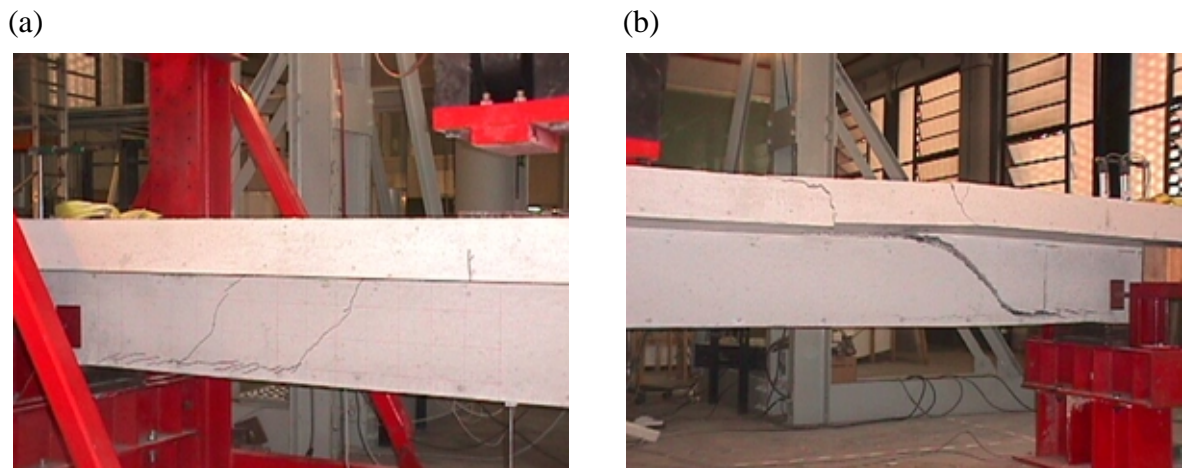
Plain concrete T-beam with 100 cm wide flange: Final state of cracking in the critical shear span (a) and on the longer span (b)
